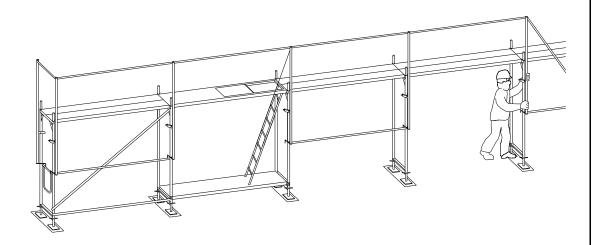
Completing the advanced guardrail over entire scaffold layer
